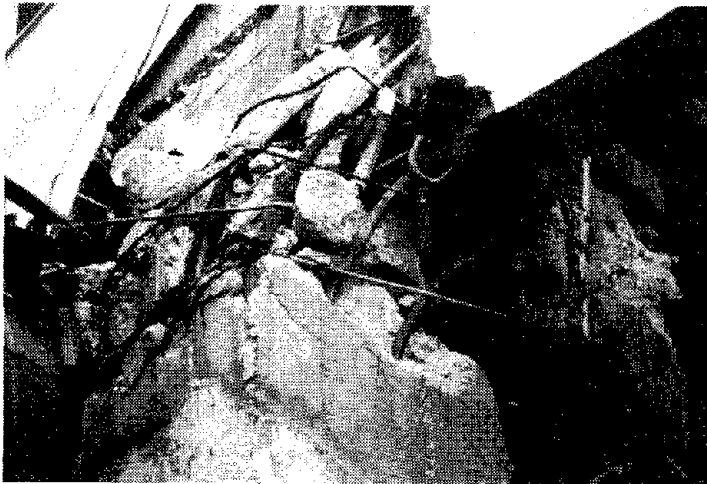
Failed beam-column joint; pre-1971 construction
